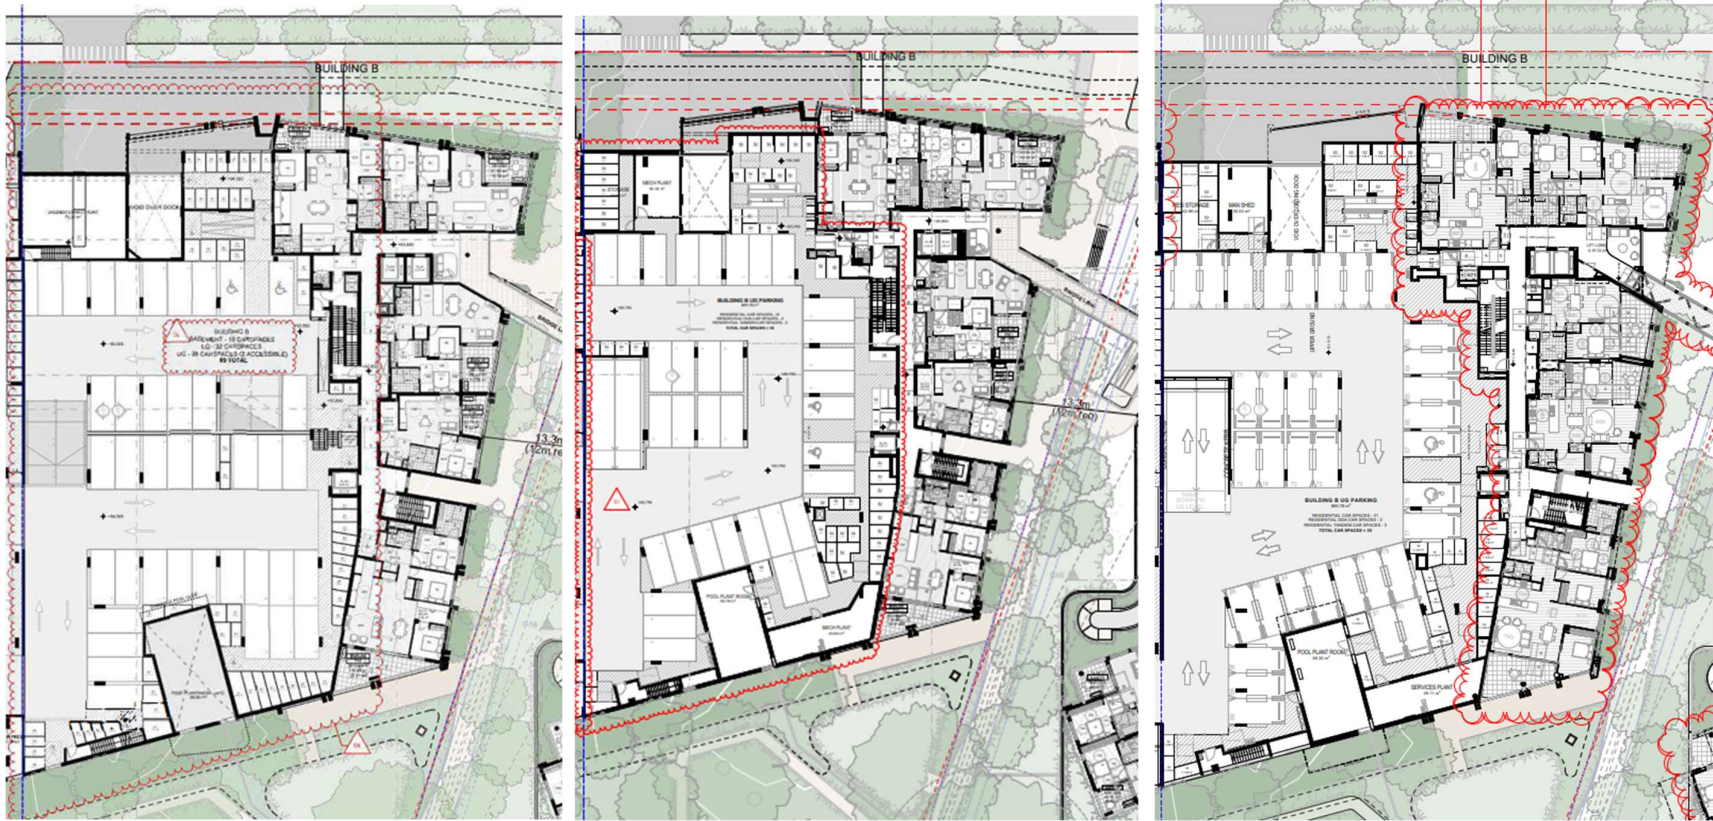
Originally Approved, DA MOD 1 and Proposed Upper Ground (UG) of Building B (2 of 3)
